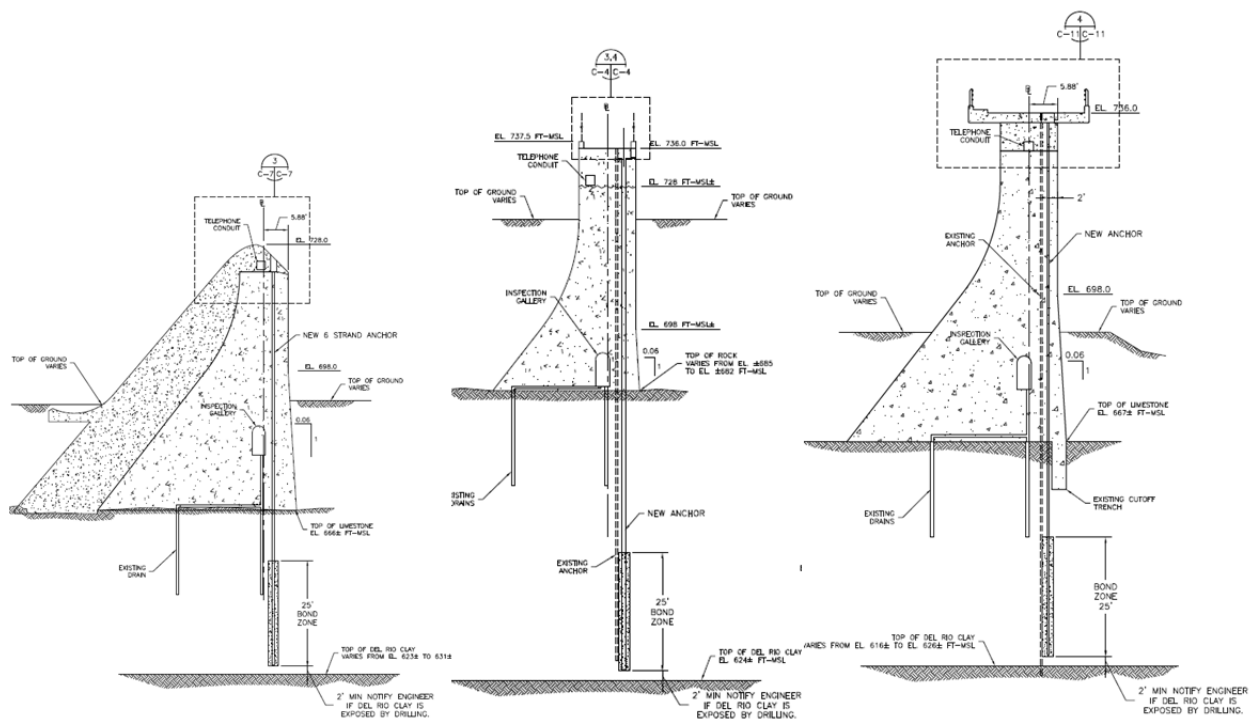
Anchor Configurations for the Overflow, Right Non-Overflow and Left Non-Overflow Sections
